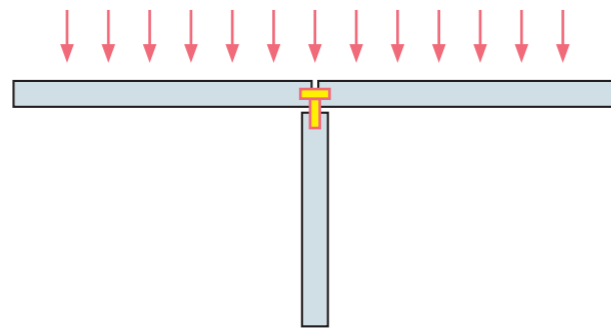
Load case: Roof panels-to-vertical beam | Source: Author
